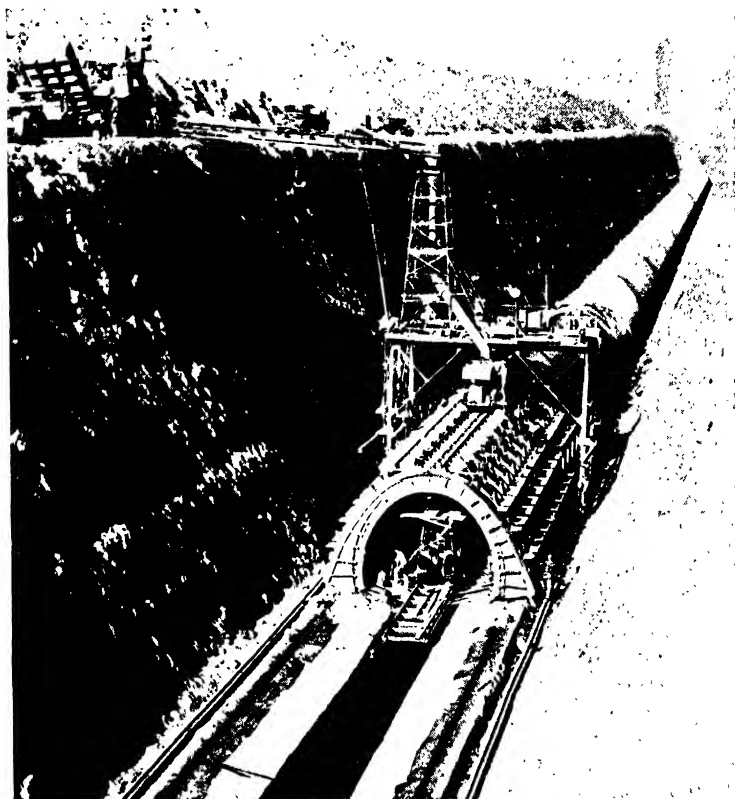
Traveling arch form and concrete placing plant on Colorado Aqueduct cut-and-cover conduit.
